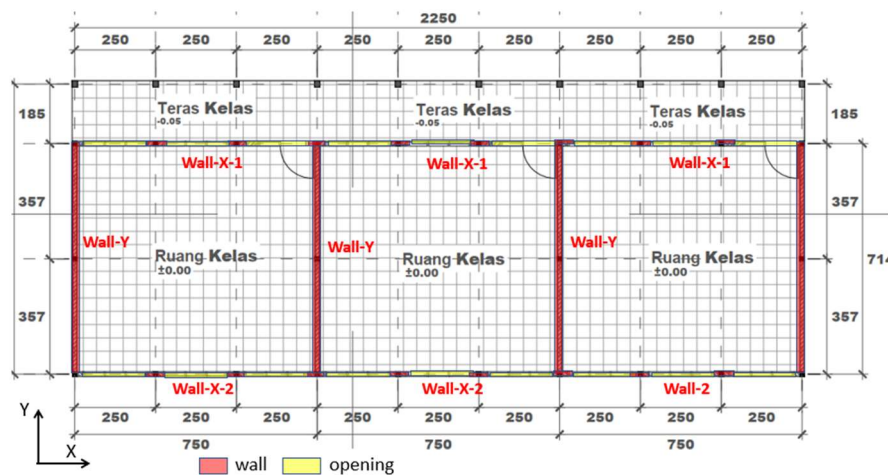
Layout of Typical one-story School Classroom Building (YSTC, 2019)
